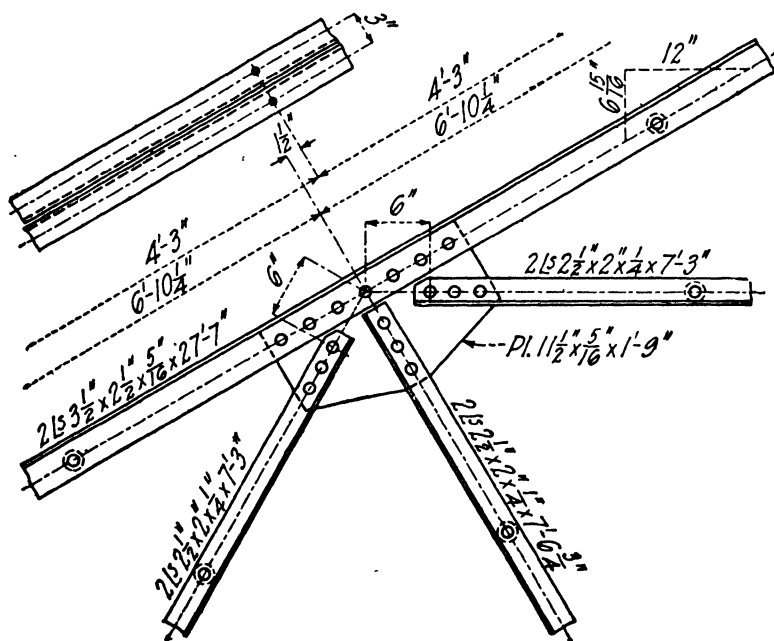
TRUSS JOINT, SKETCH DETAILED.
